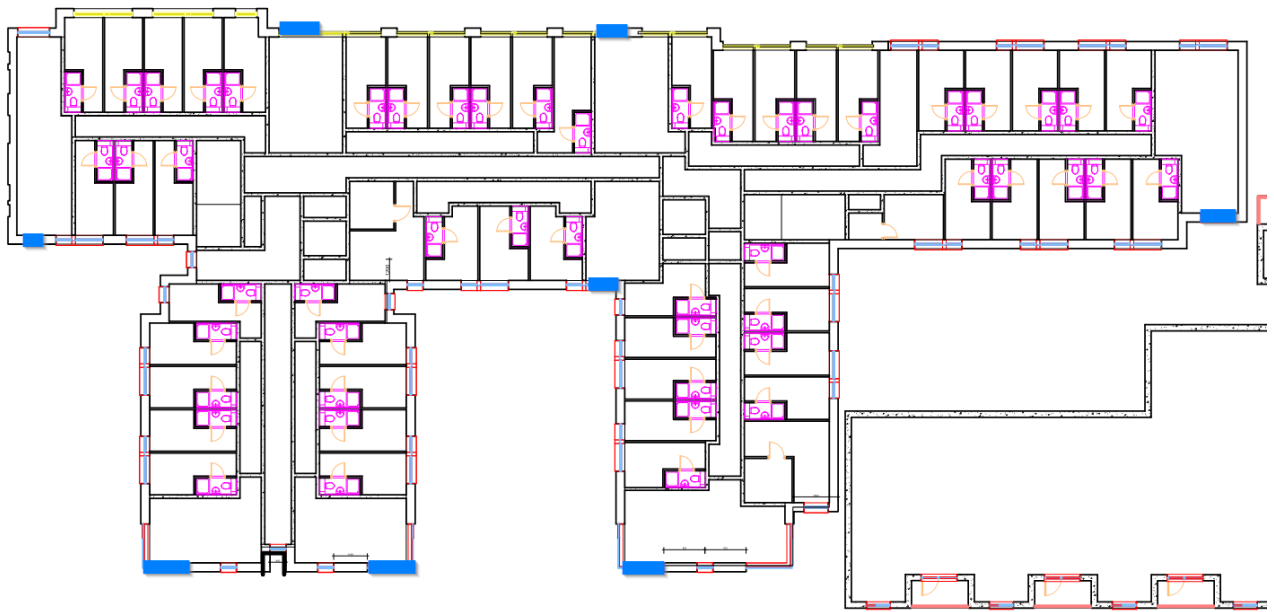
Sunlight Analysis Window Key – Ground Floor
